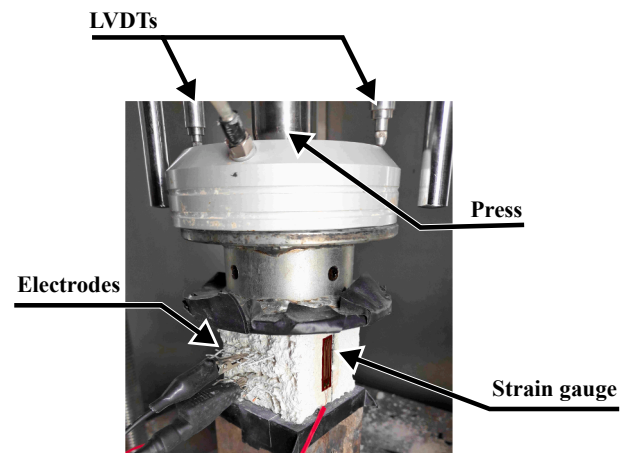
Test setup and deformation sensor layout for electromechanical testing.
